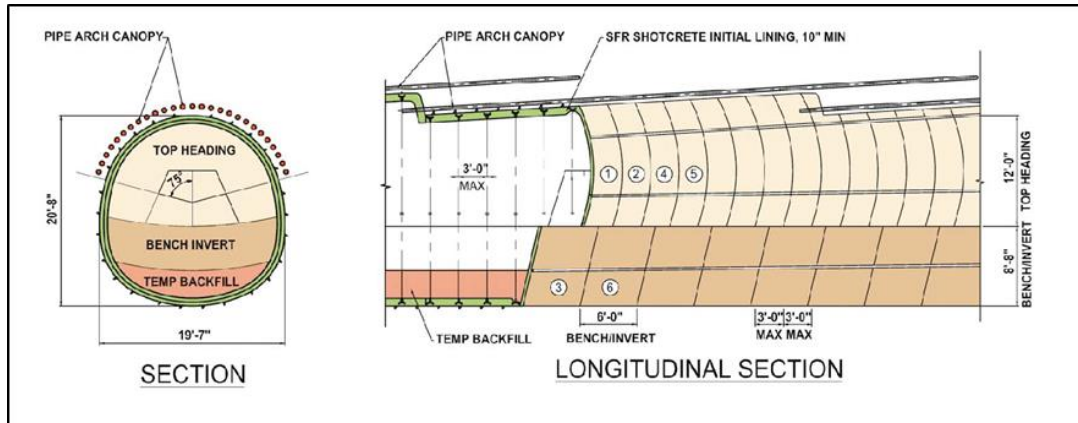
NATM/SEM Tunnel with single pipe arch pre-support for shallow soft ground tunneling
